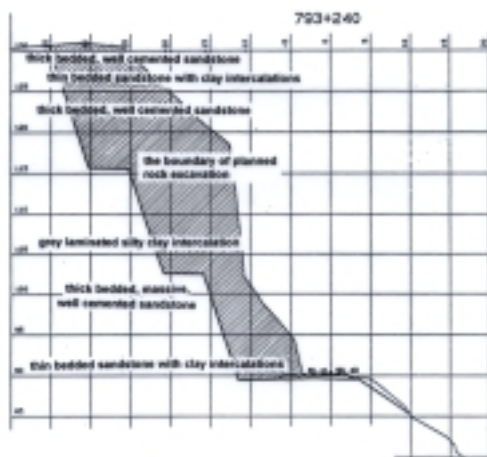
Three-stepped excavation profile of the cliff face in the section 793+240 (after BOHUS, G.)
